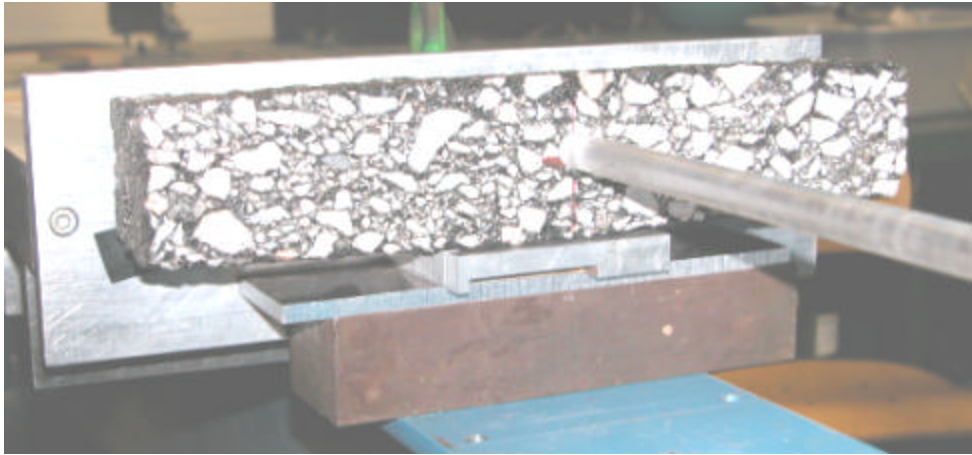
Dynamic fracture setup with failed specimen due to impact loading of incident bar.
